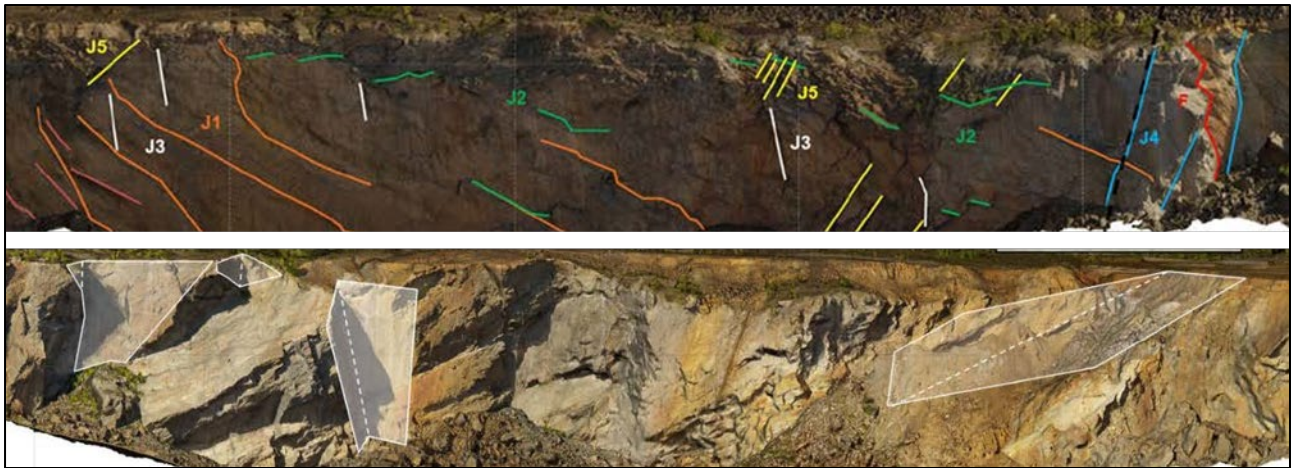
Examples of structural features and structurally controlled failure mechanisms on open pit benches identified using photogrammetry DEM
